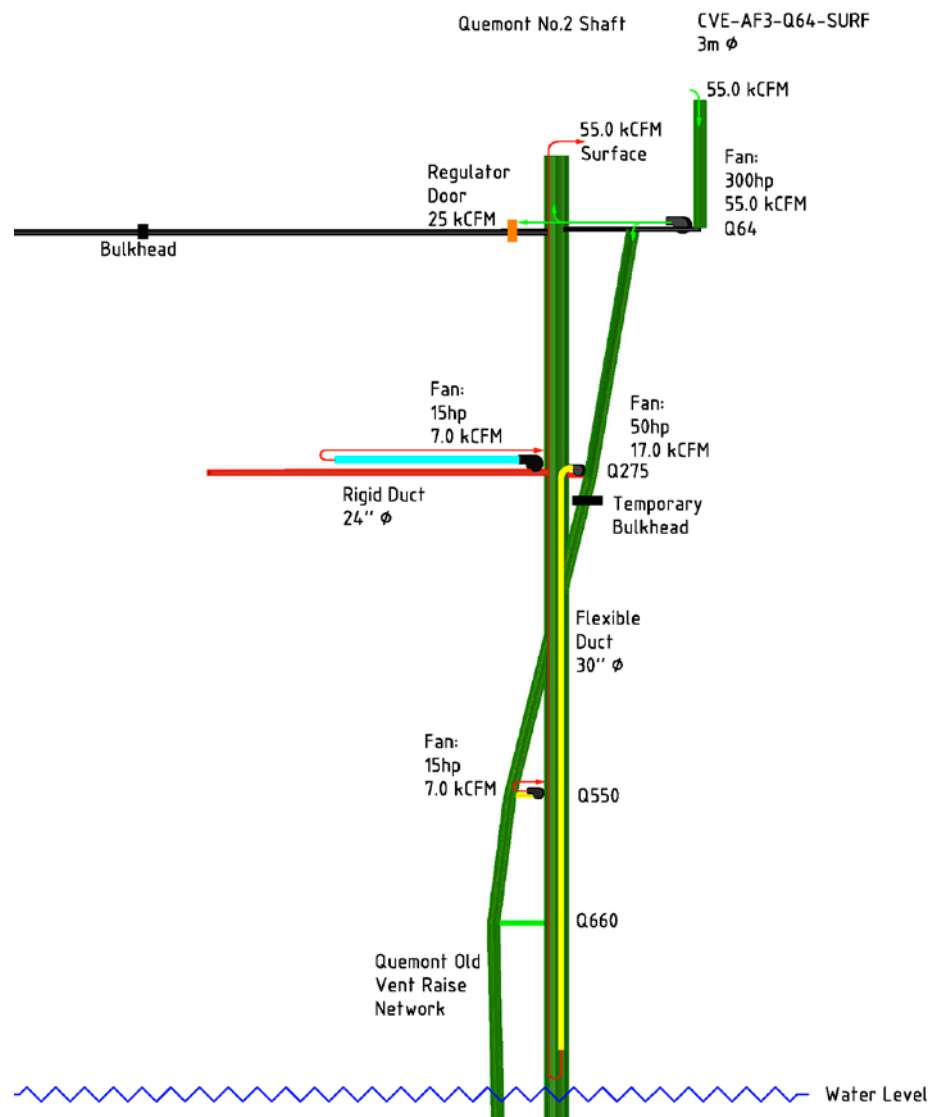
Dewatering and rehabilitation ventilation – step 3
